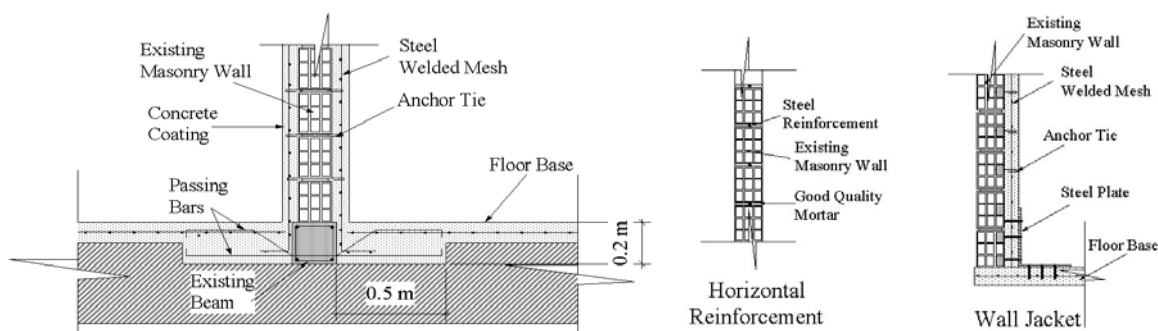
Transversal wall jacketing (left) and longitudinal wall strengthening (right)
